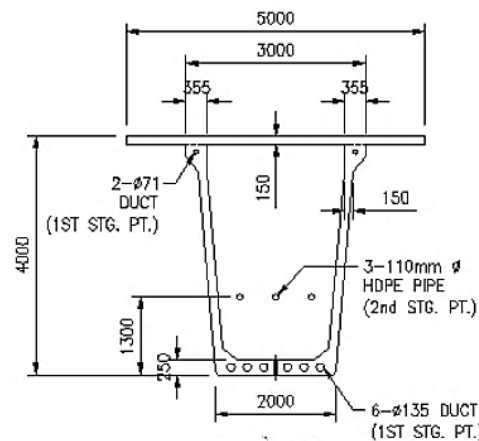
Detail of UHPC box girder of Batu 6 Bridge [mm] [34].
